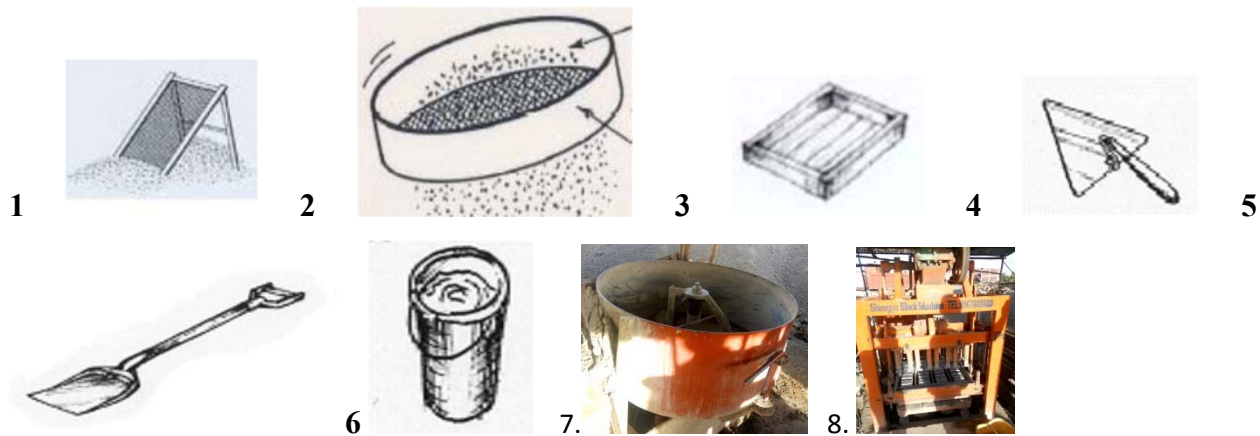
Tools, Machinery & Equipment used for HCB production
